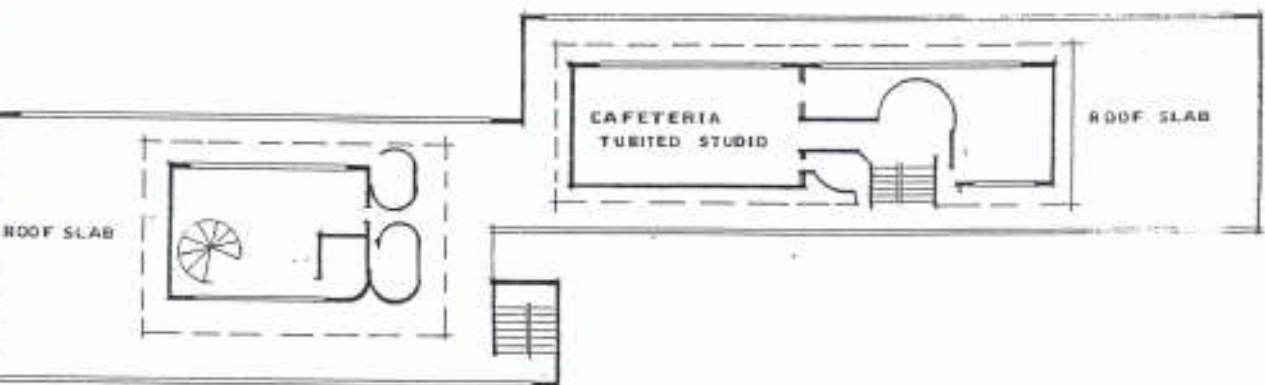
Plan Showing Rooftop Cafeteria and Studio
